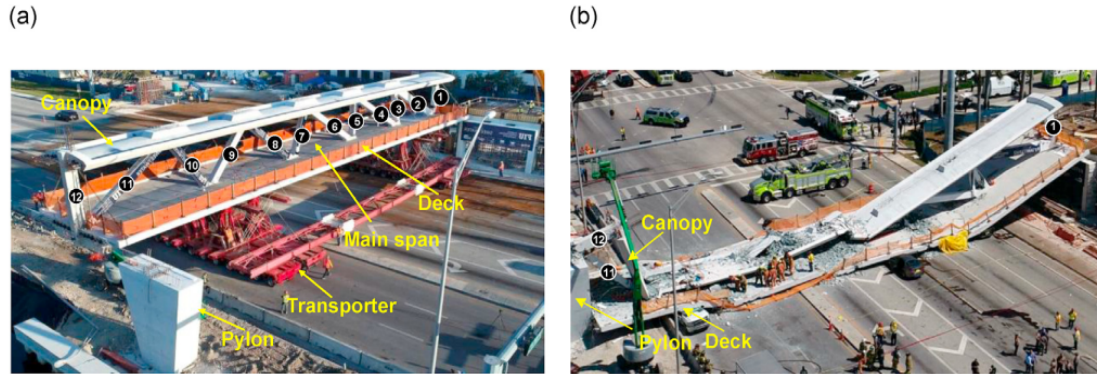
Collapse of FIU Pedestrian Bridge. (a) Before collapse. (b) After collapse.
